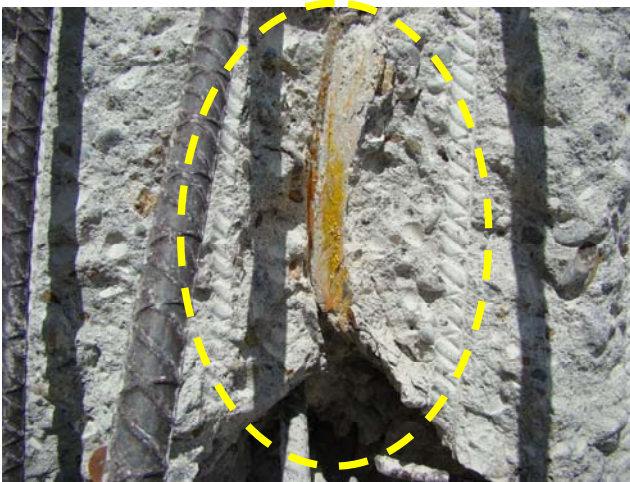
Damaged of A2 Abutment (Failure of Parapet Wall)
